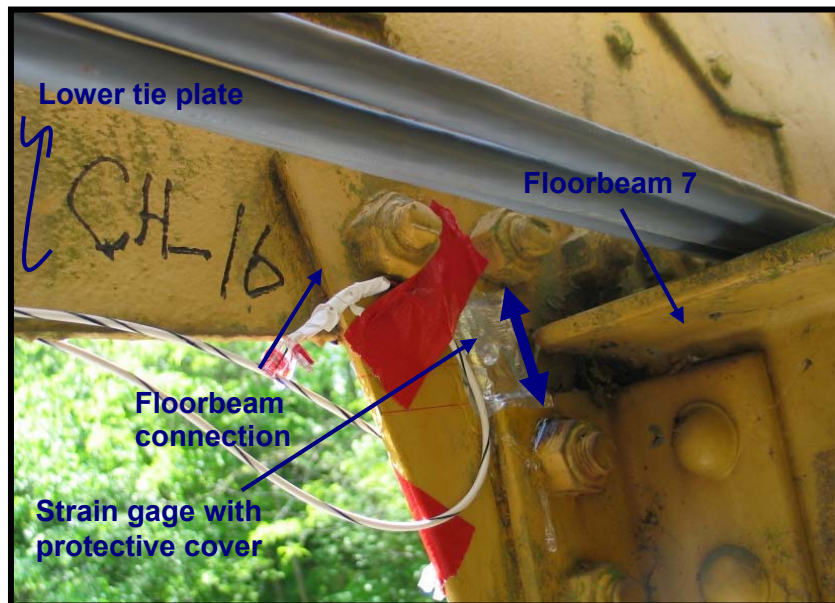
CH\_16 installed on the back face of the connection plate at floorbeam 7
